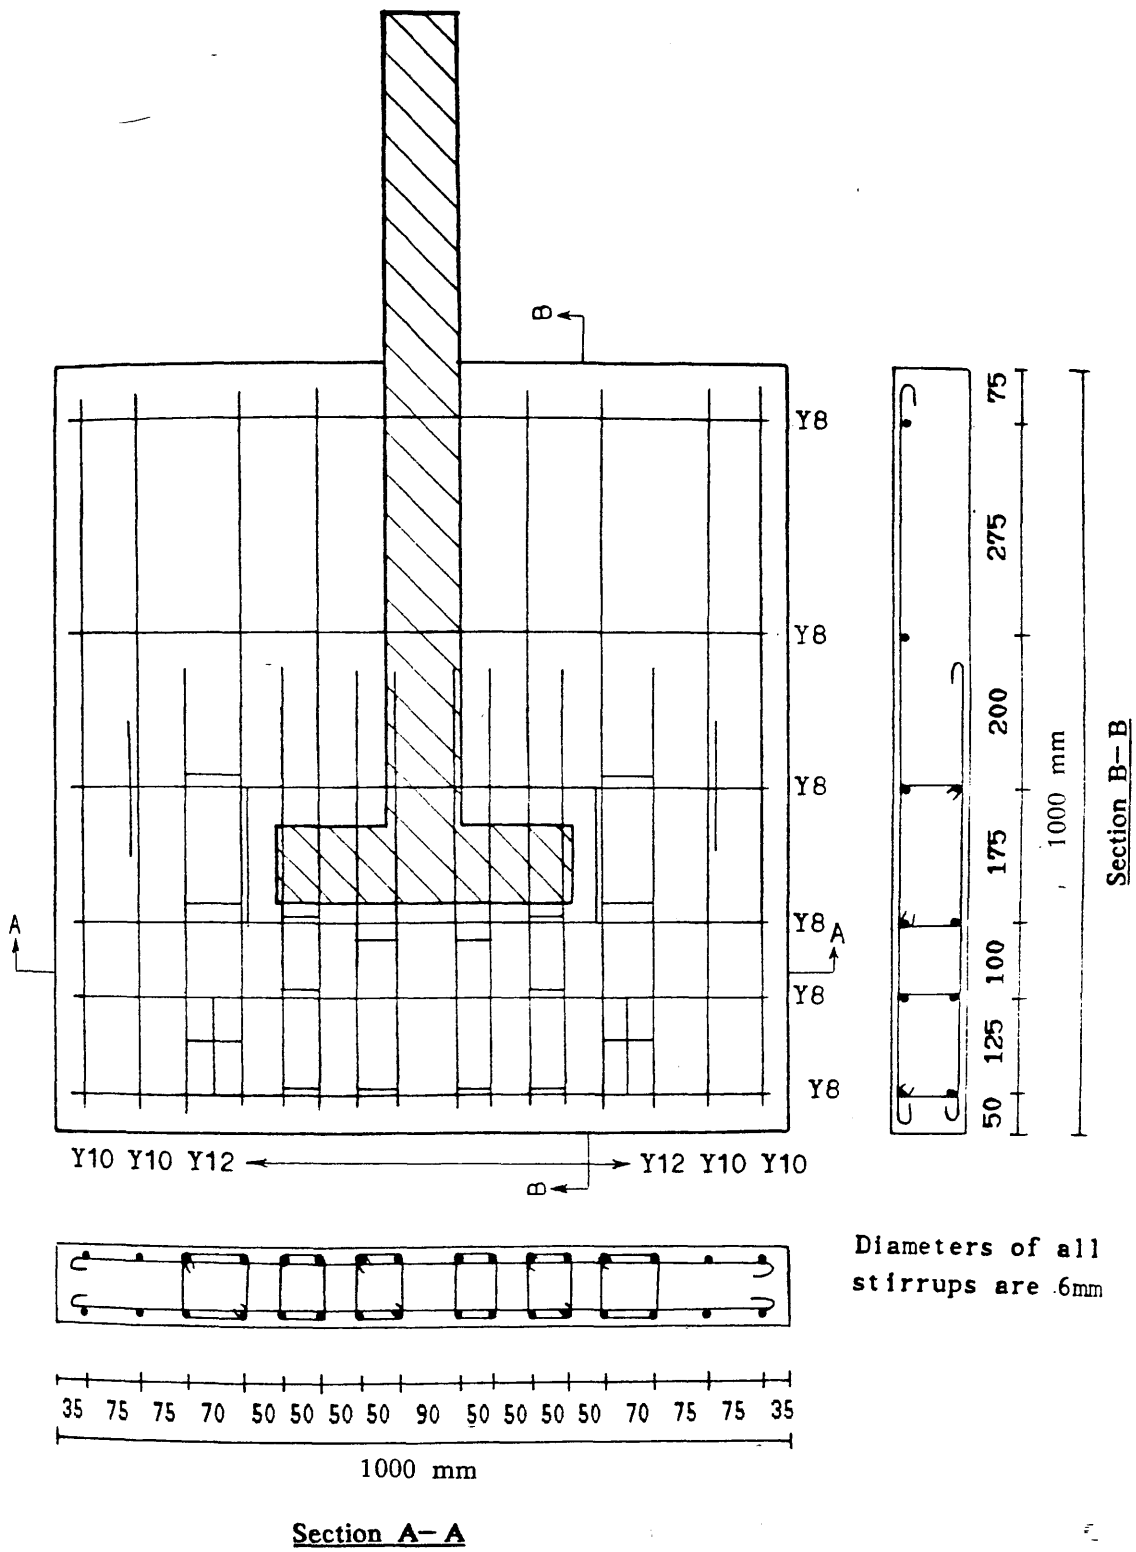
a) : Arrangement of top reinforcing bars including closed vertical stirrup in the slab of model MS12
